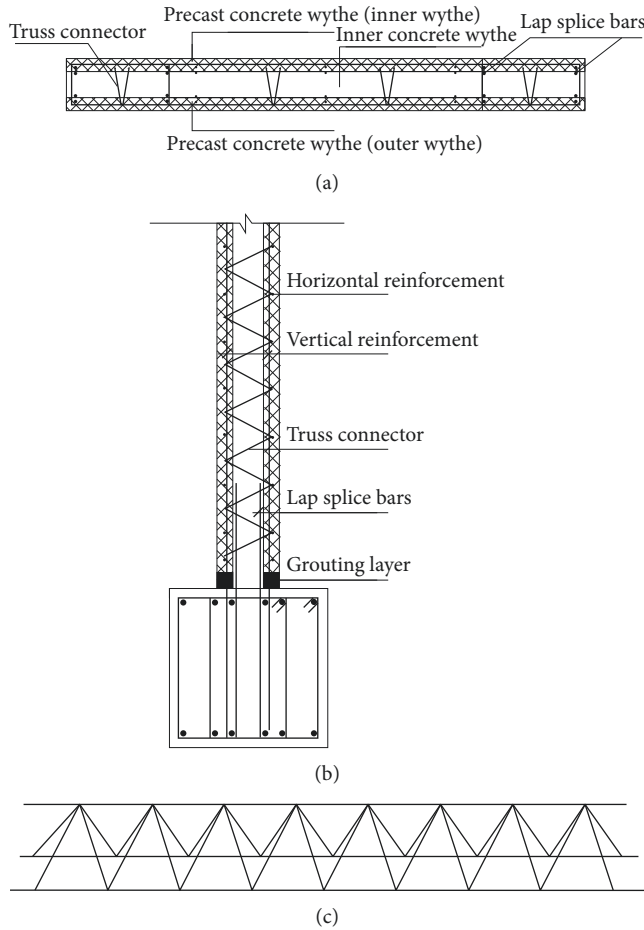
Configuration of the superposed shear wall: (a) cross section forms; (b) lap splice bars across horizontal joints; (c) truss connector.
